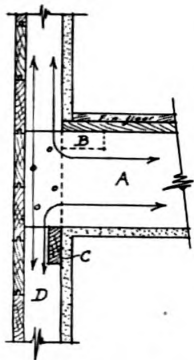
Studs are often continuous through the two stories, joists resting on a ribbon, which is typical balloon framing.
